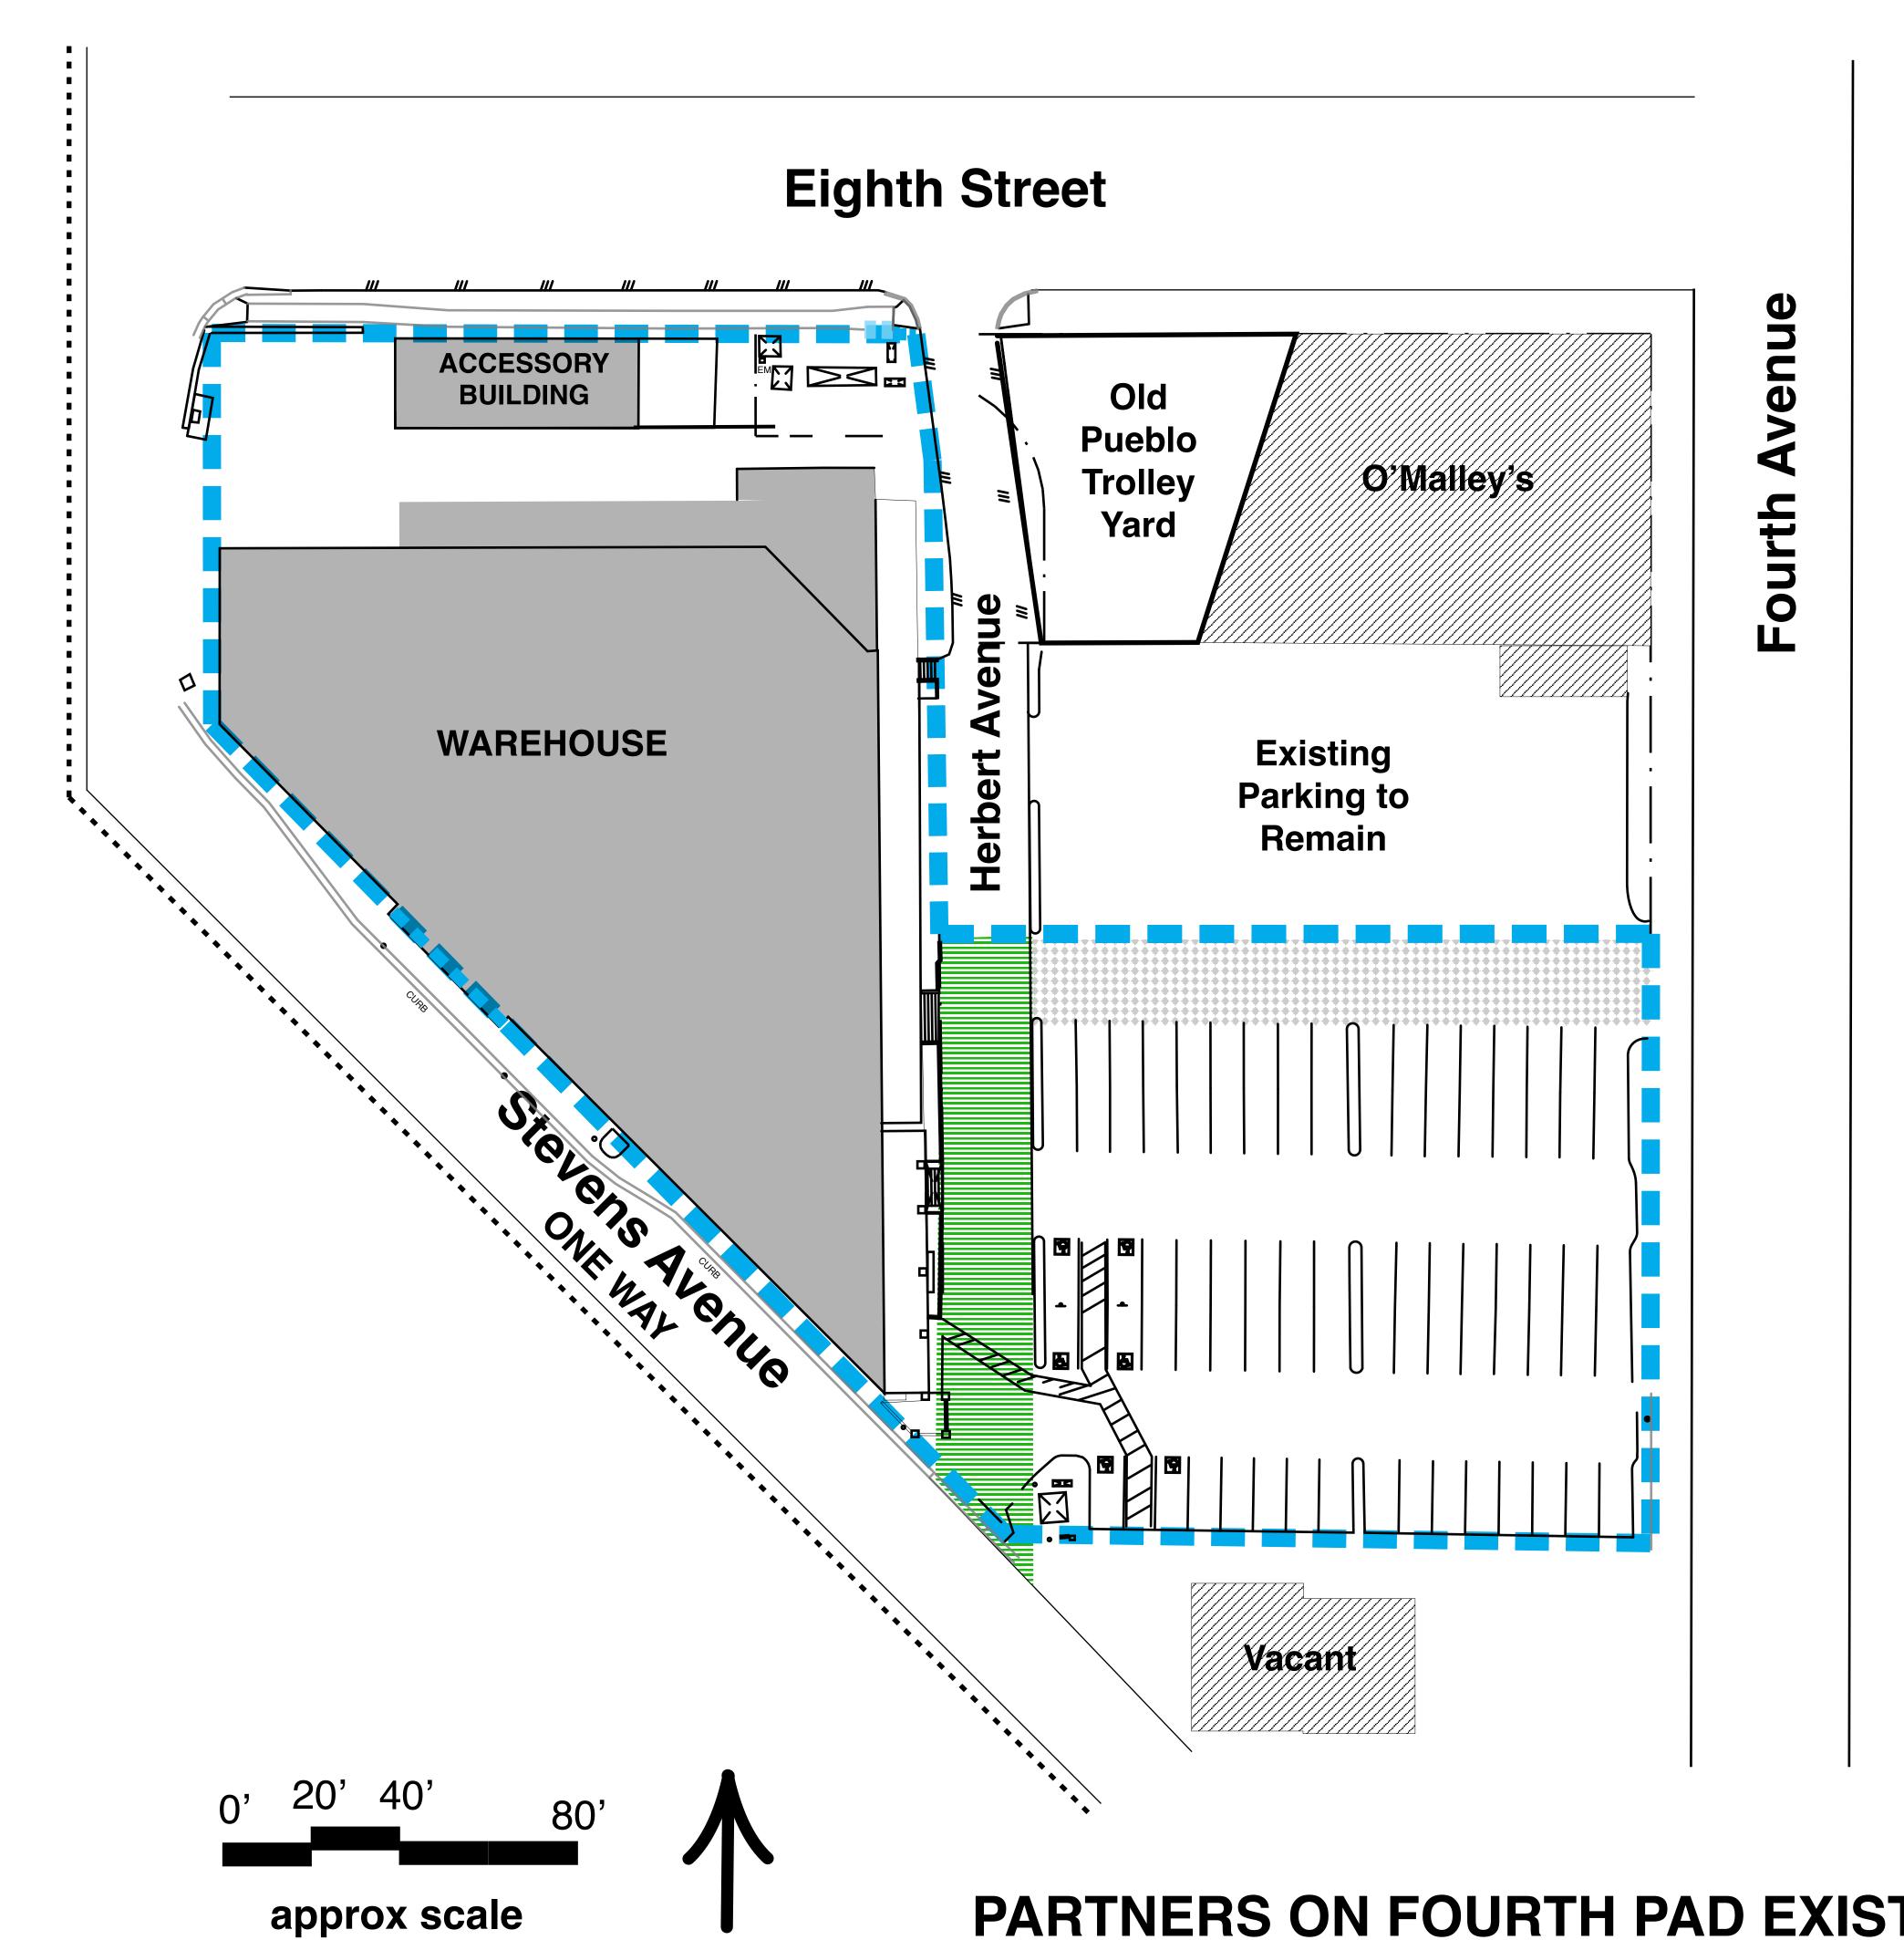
EXISTING PAD SITE CONDITIONS
